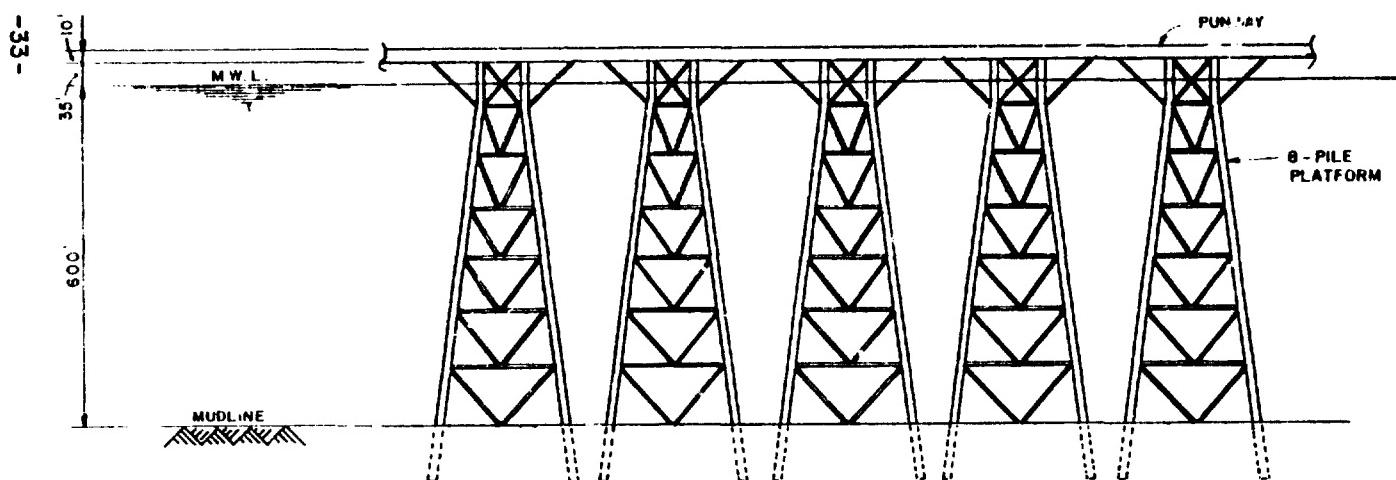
RUNWAY, PLATFORM STRUCTURE - PILE SUPPORTED CONCEPT
